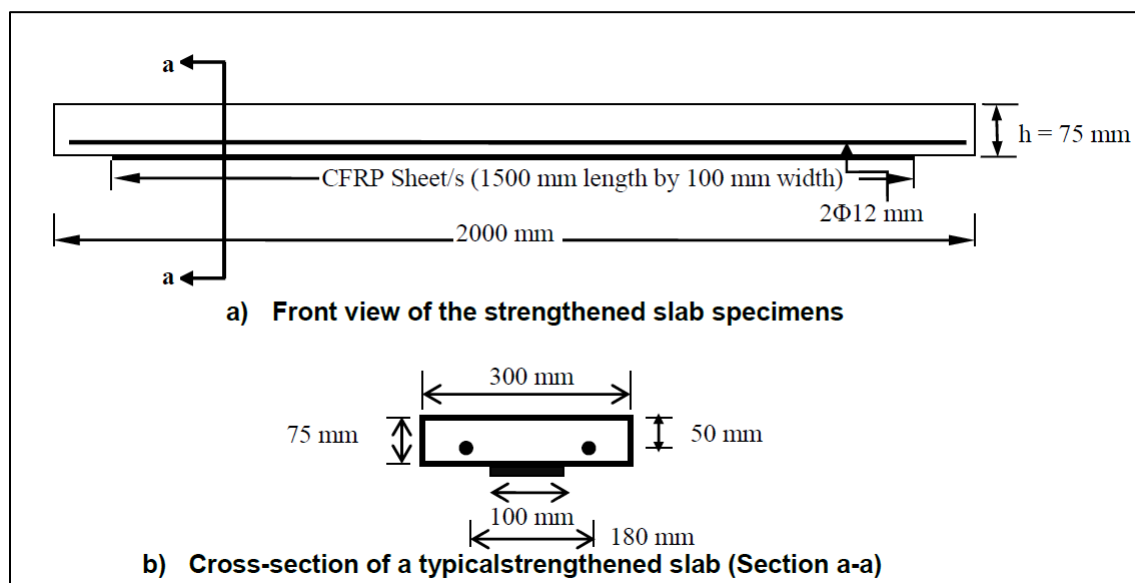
Details of the slab specimens (Hawileh et al., 2016)
